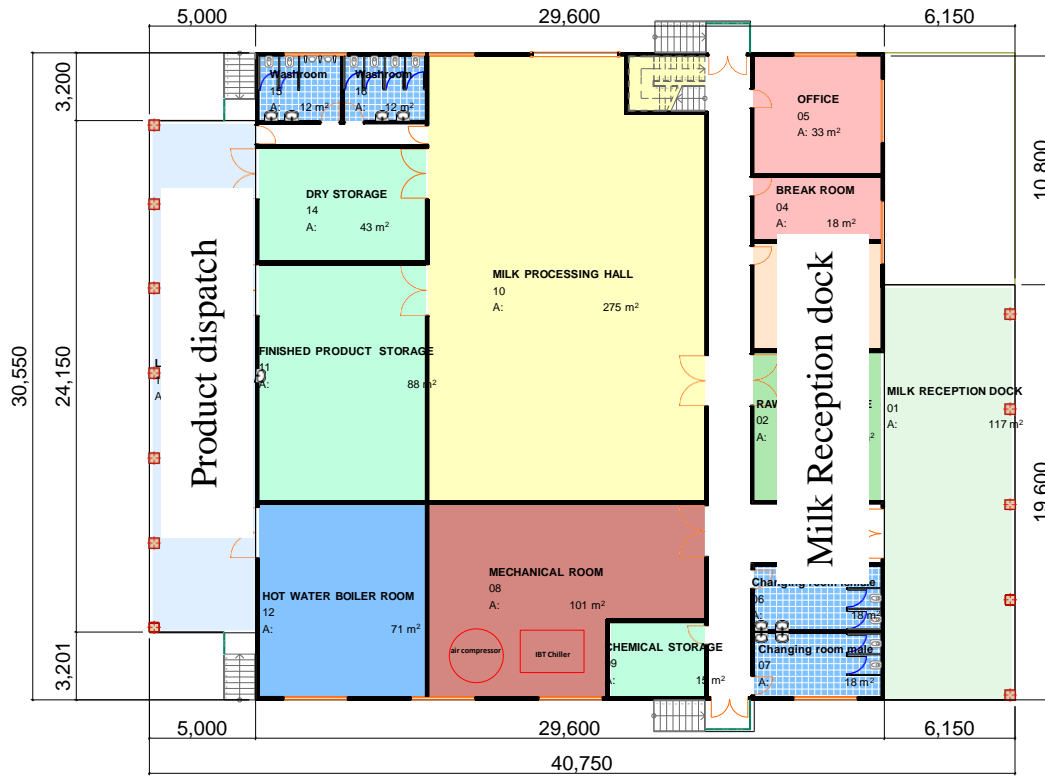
General layout concept of a dairy plant. Some of the offices could be on Mezanine floor overlooking the processing hall.
